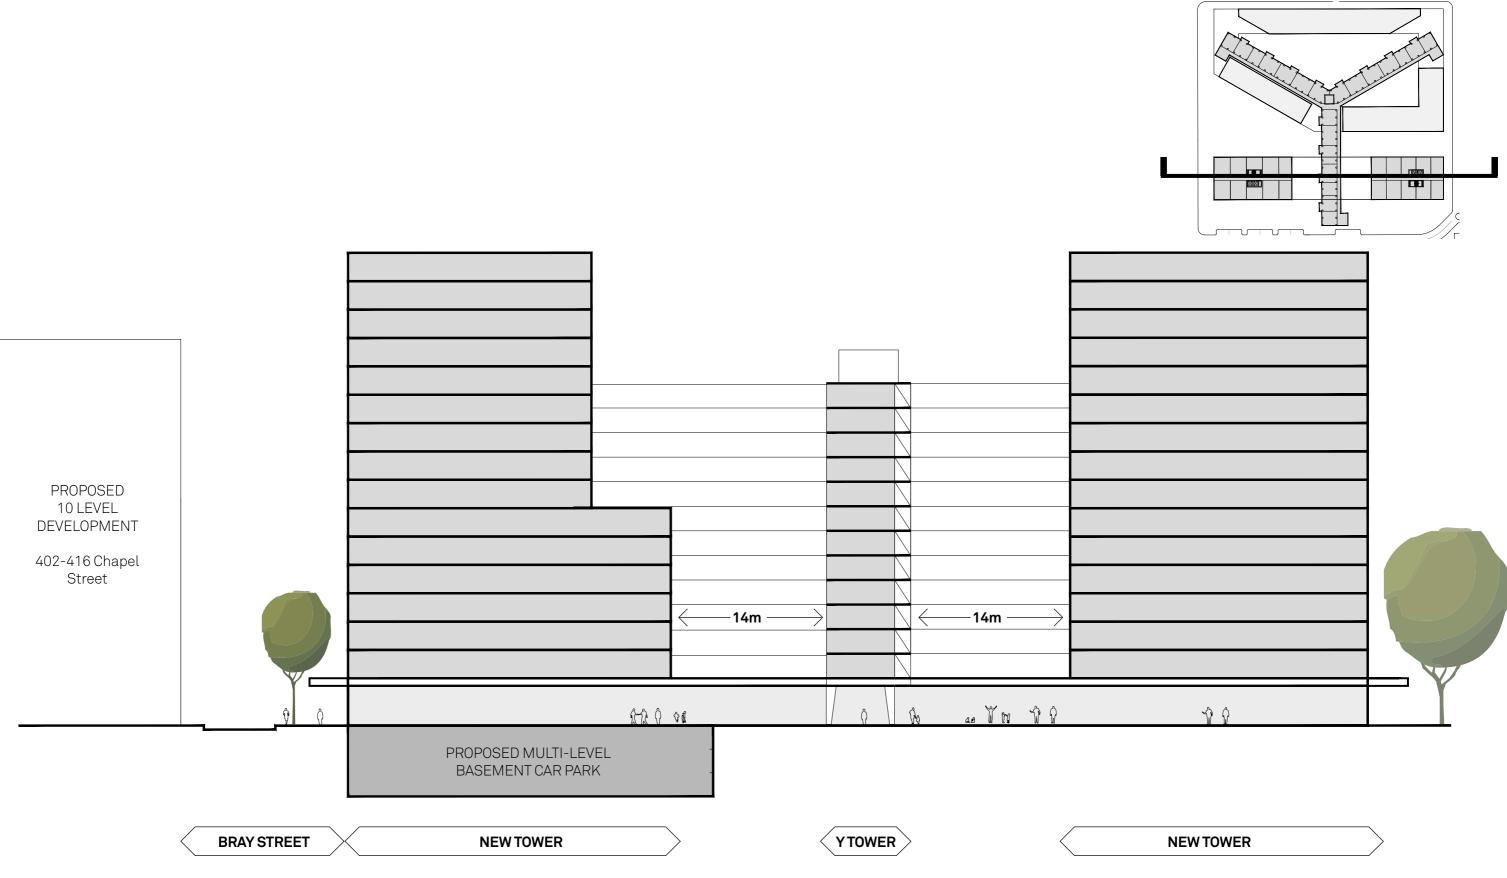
Building Setbacks - Horace Petty North East Quadrant
